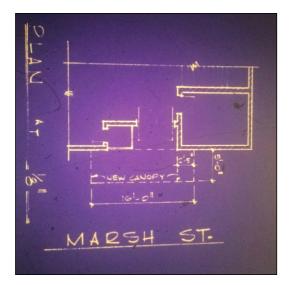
Plan view of new canopy above original doorway and display case, constructed in September 1962 by Maino Construction (City of San Luis Obispo microfiche, 1144 Chorro Street).
